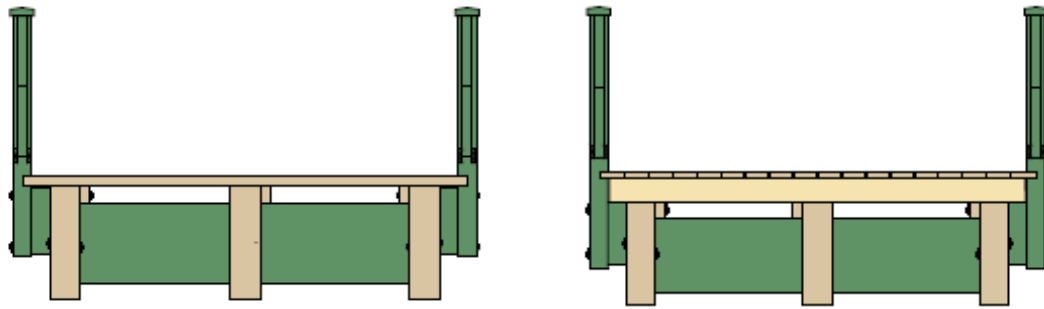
Timber beam bridge cross sections. The left figure is a bridge without transversal beams and in the right one is transversal beams included to carry the bridge deck, (Martinsons, 2010).
